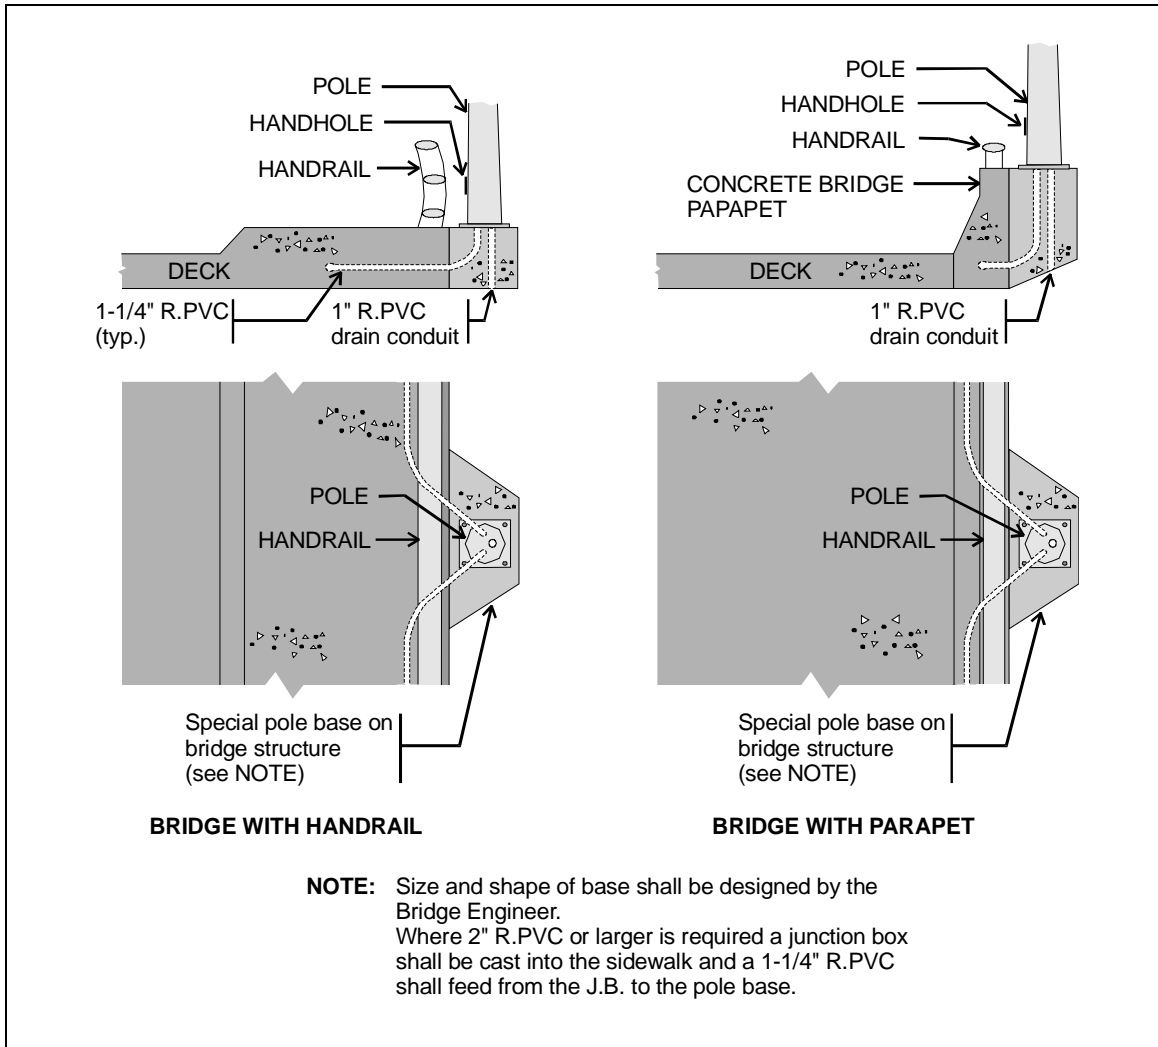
Typical Luminaire Pole Mounting on Bridge Structures
